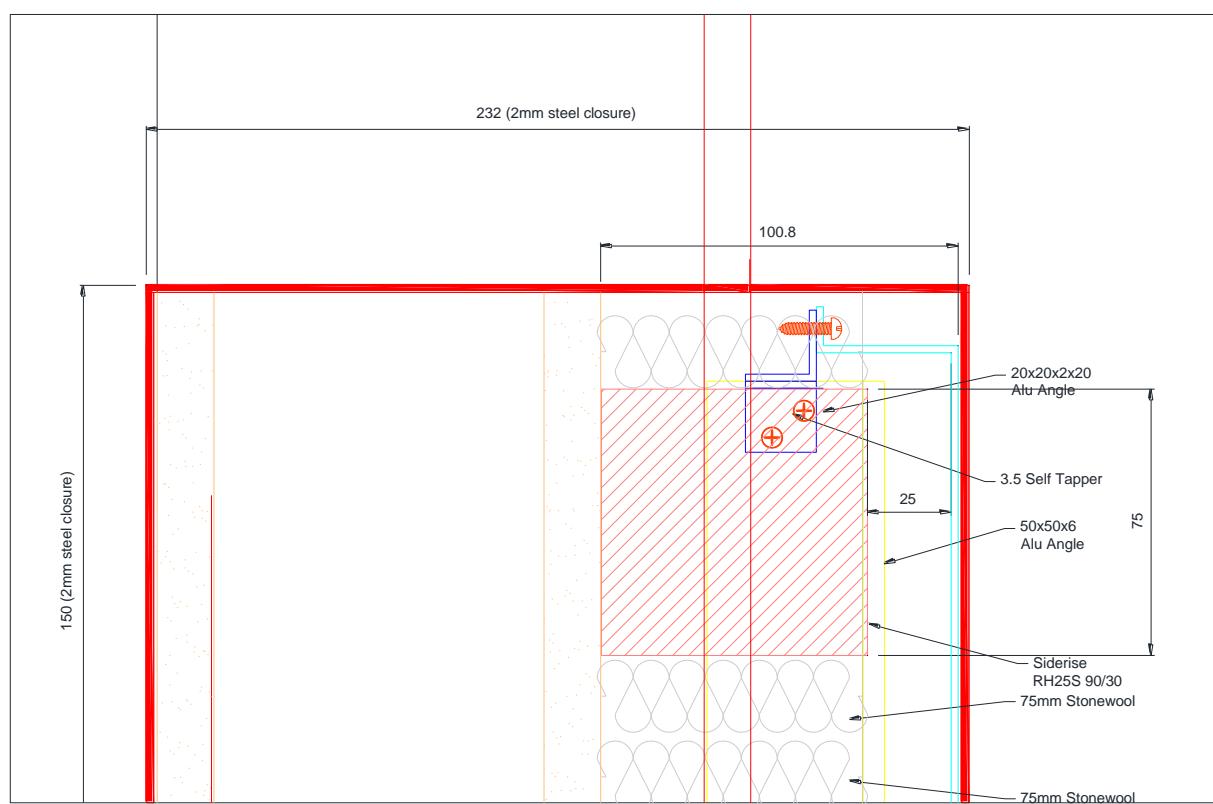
Detail D03 (Vertical panel to panel joint) of the specimen.
